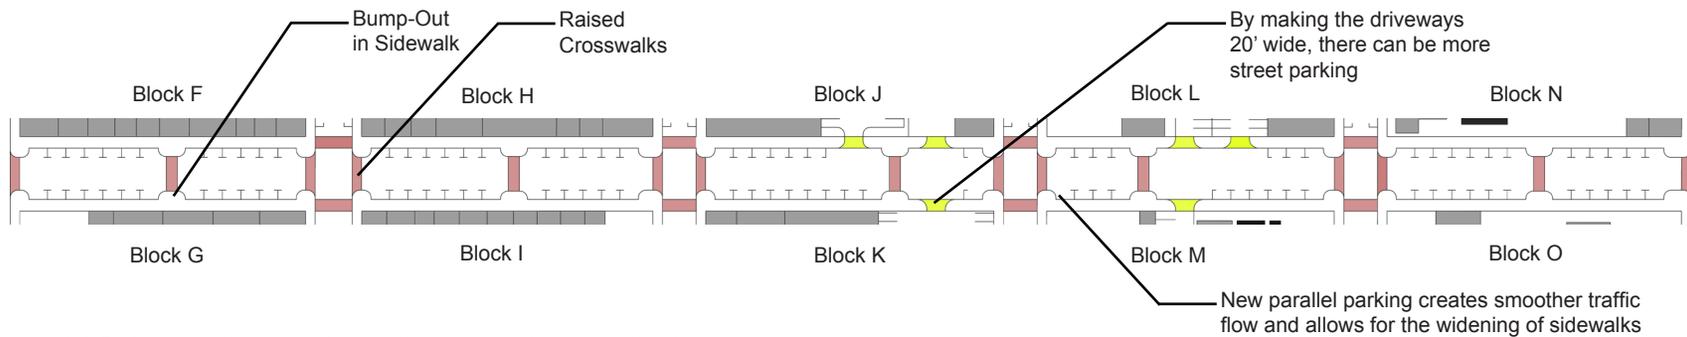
Proposed On-Street Parking Condition for Broadway Street
